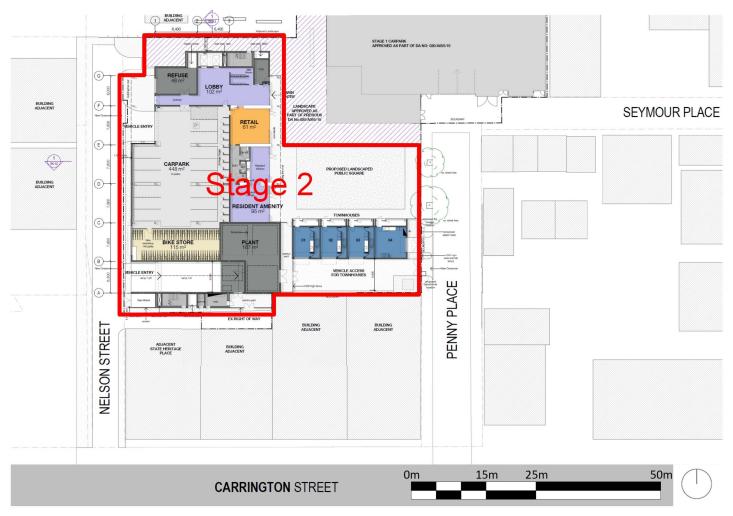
Ground Level site plan for the Development. Reproduced from plans provided by Project Architect, dated 27 October 2017
